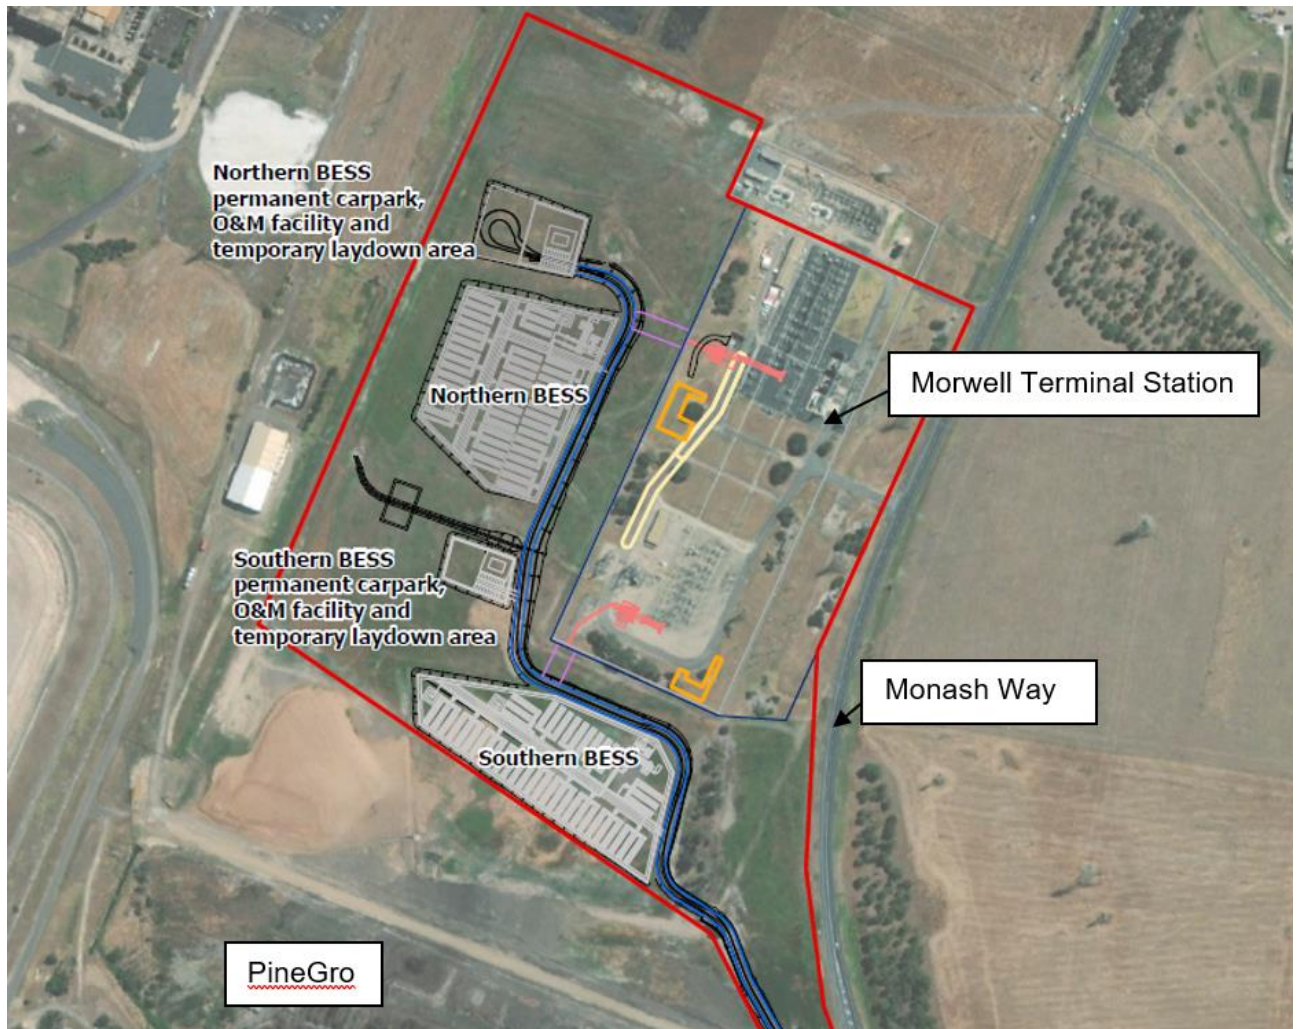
Latrobe Valley BESS Proposal (excerpt from Site Layout Plan)
